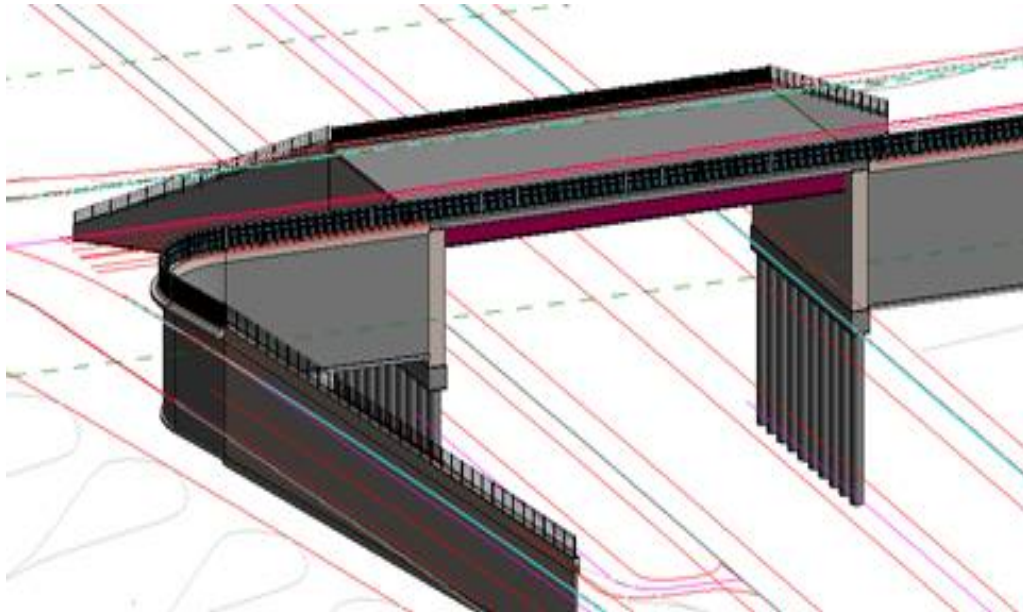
Schematic of Proposed M5 J10 North Bridge
